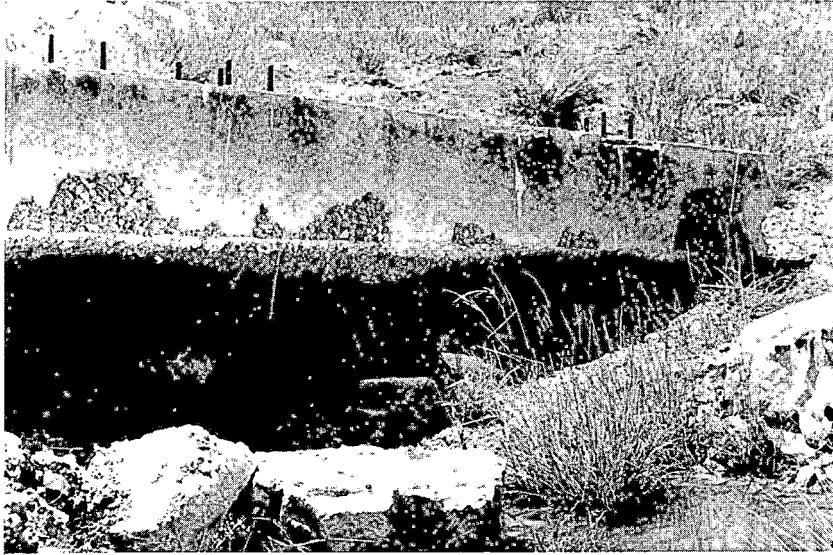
VIEW OF CONCRETE PANEL REMOVED FROM TRACK
